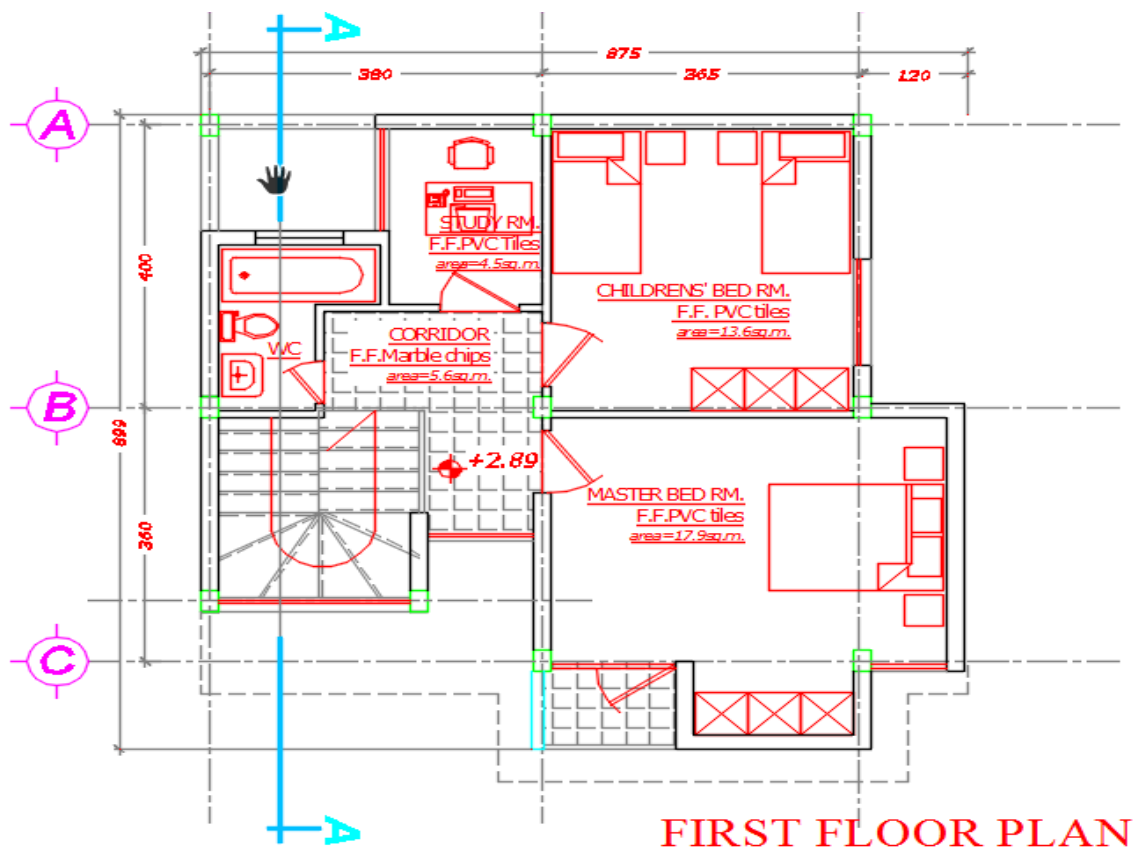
Sample typical first floor plan for existing concrete structure scale 1:50
